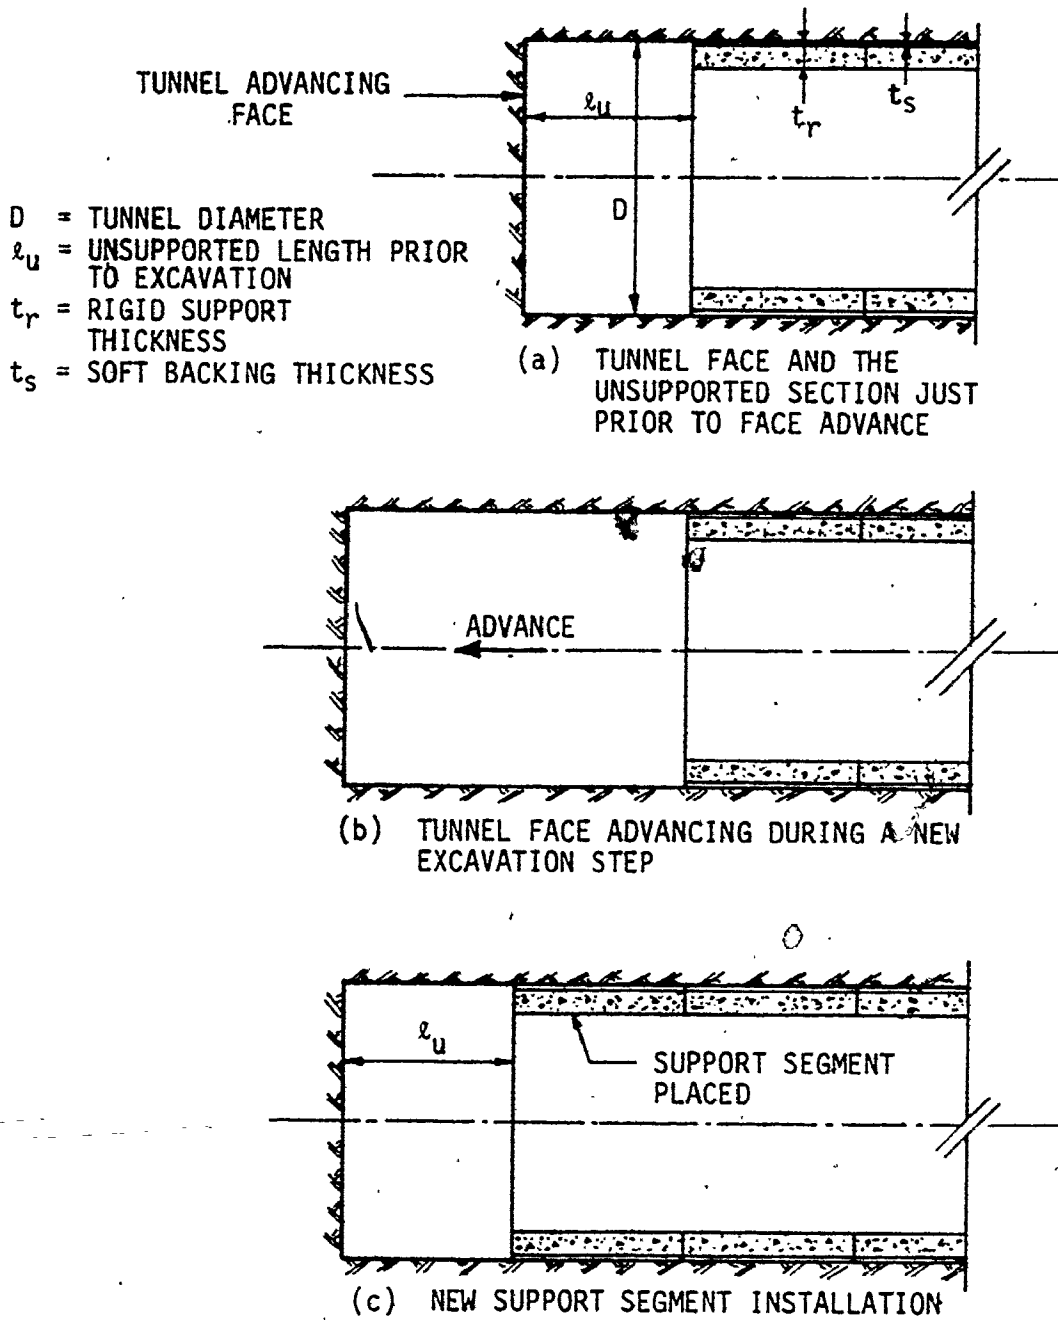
TUNNEL EXCAVATION AND SUPPORT INSTALLATION
